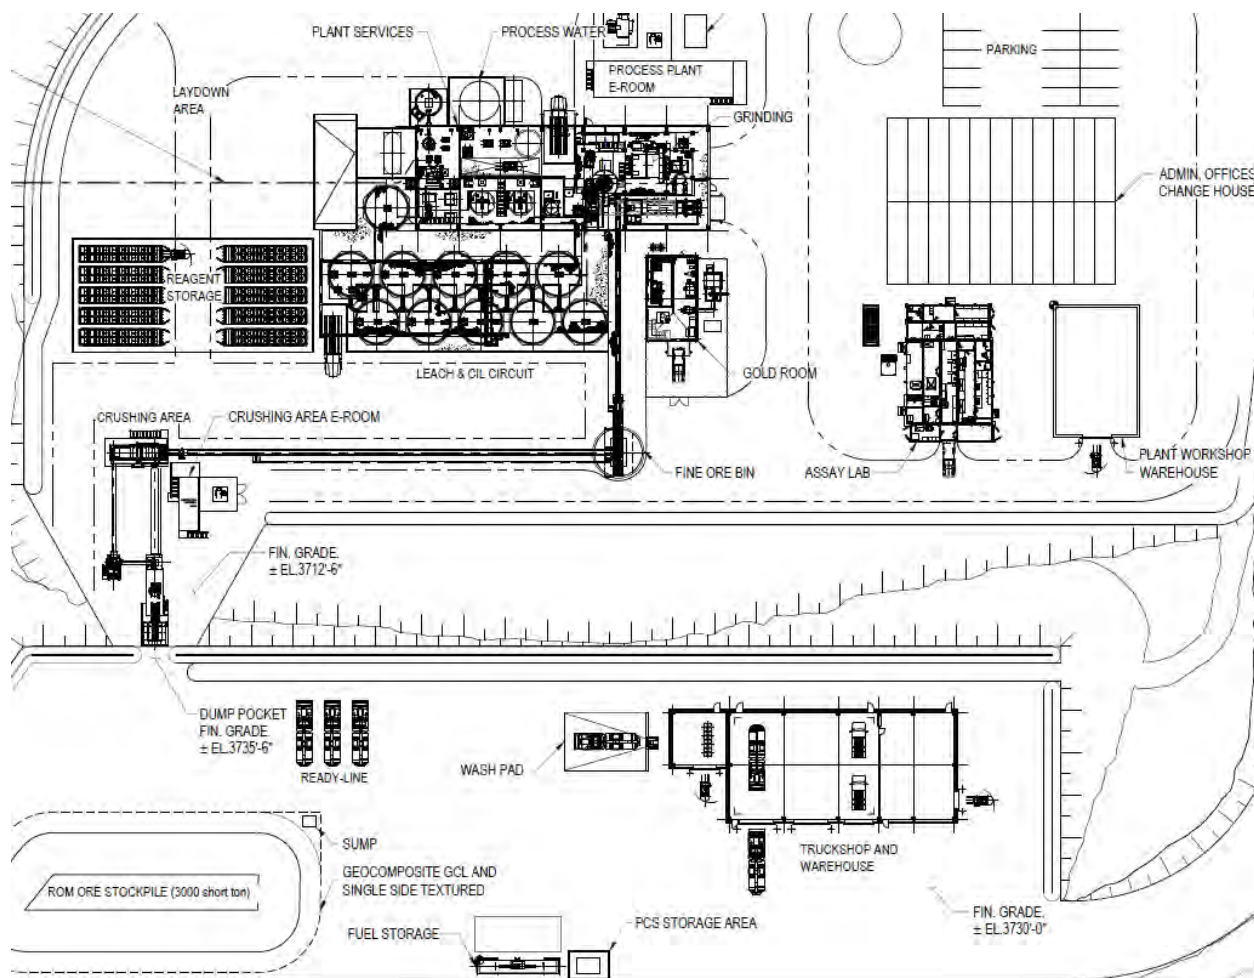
Grassy Mountain Gold Project Surface Facilities Layout
